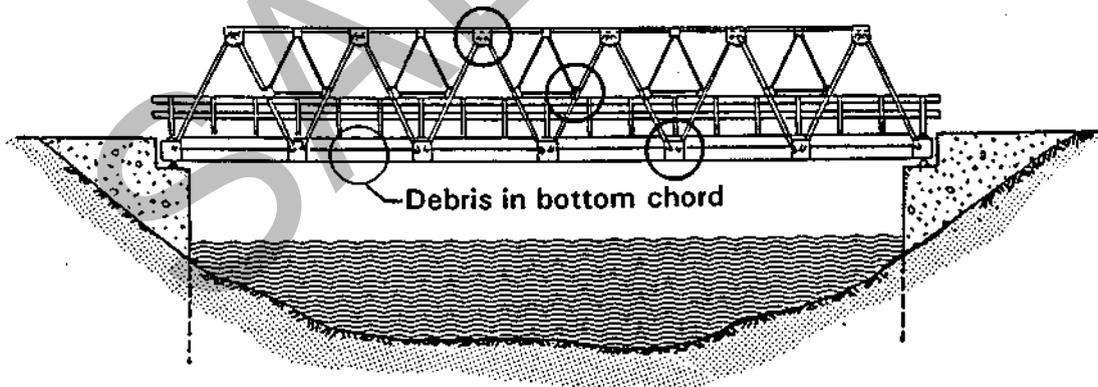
Common Locations of Corrosion in Steel Truss Bridges
